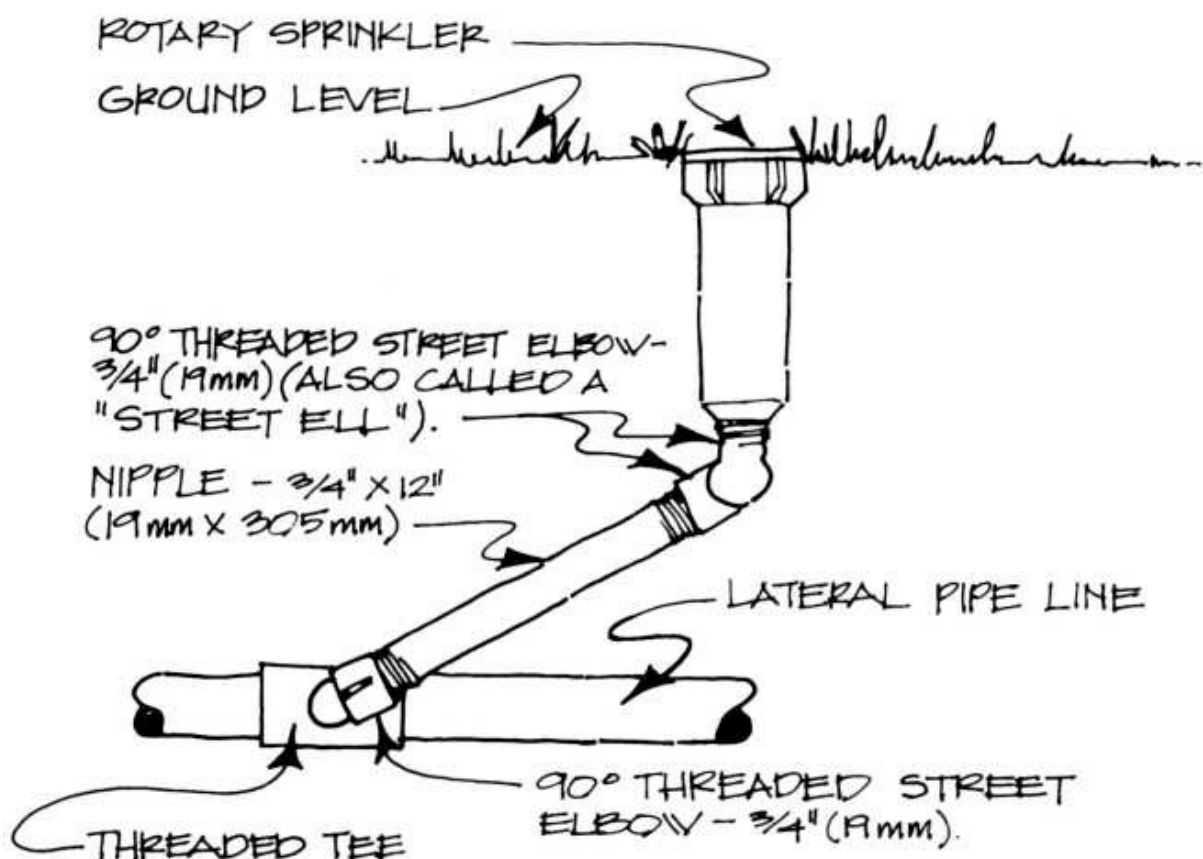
1 Triple swing joint and sprinkler head installation.
